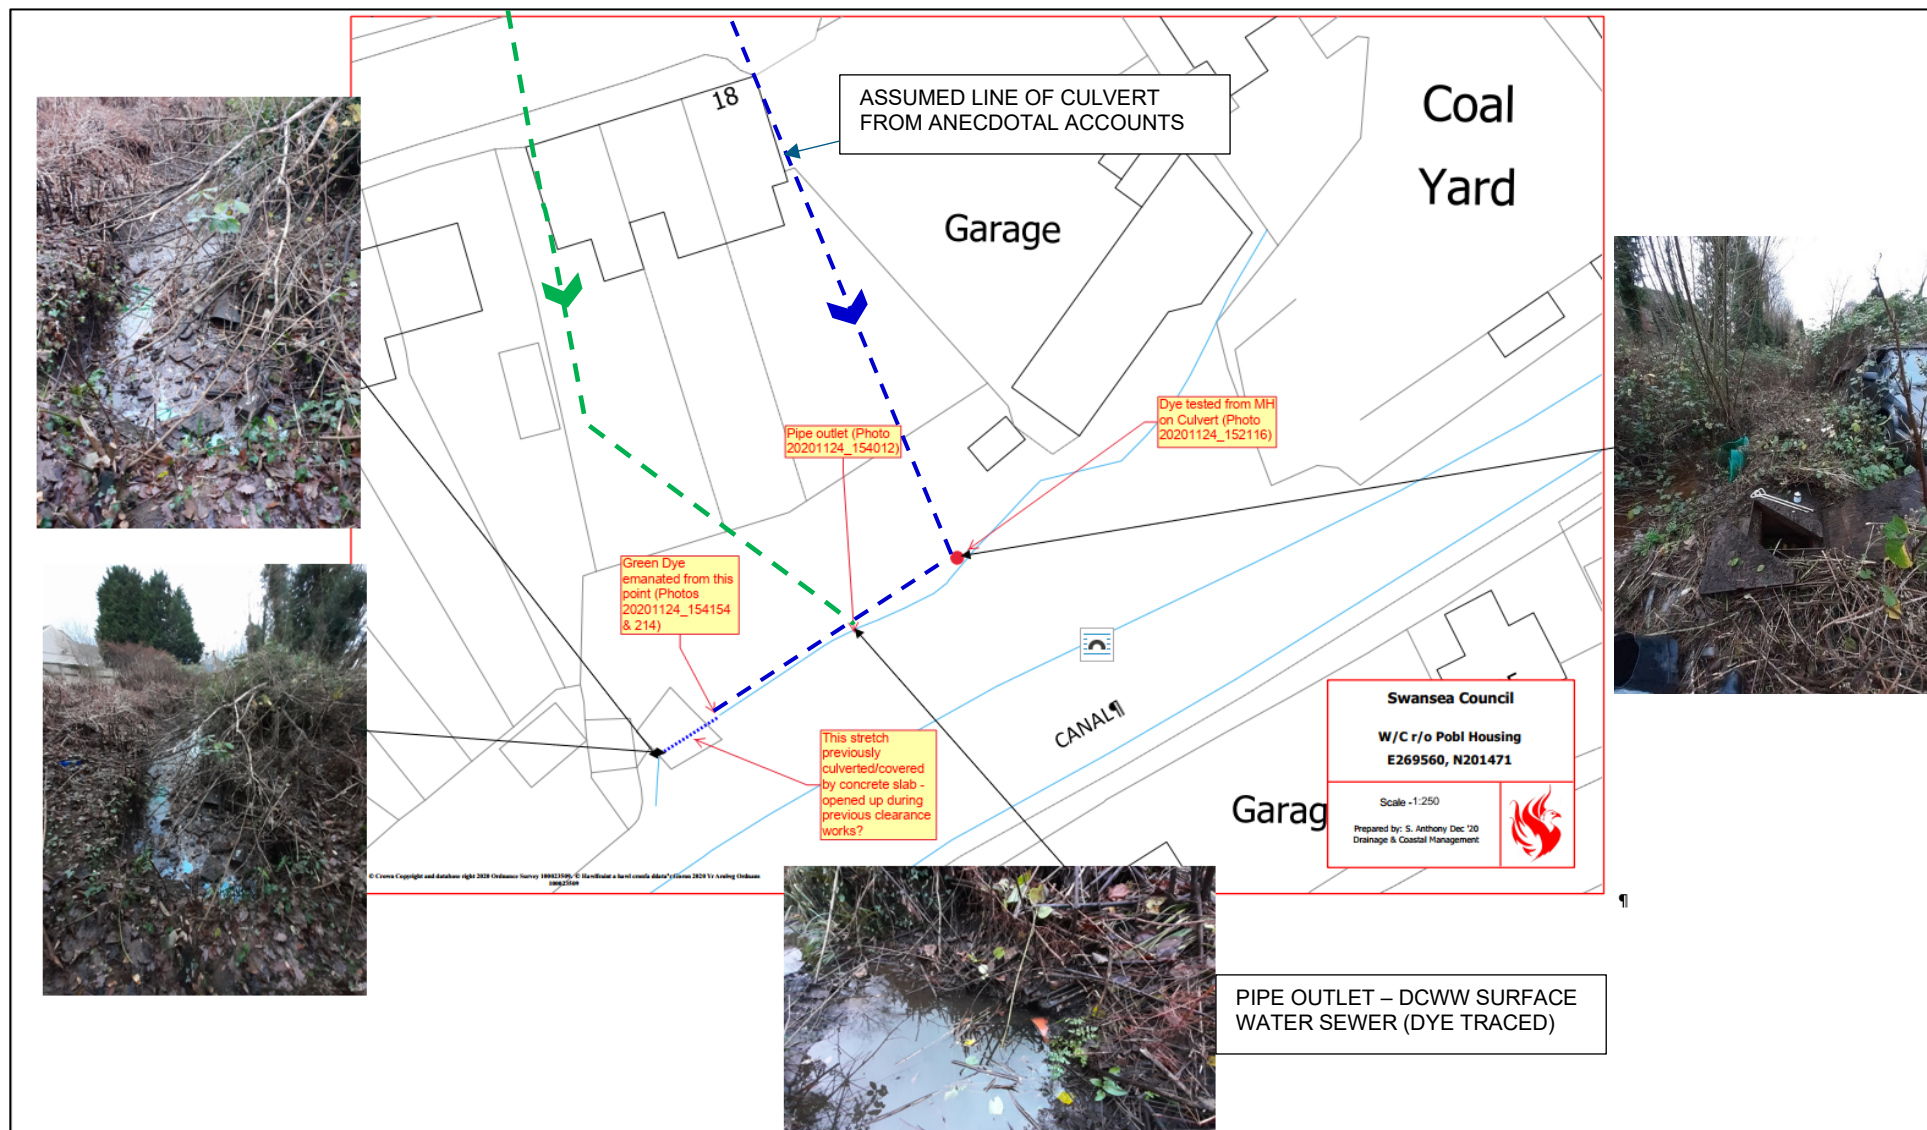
General layout of sections of “Enid” Stream south of Capel Road to the Canal Syphon.
